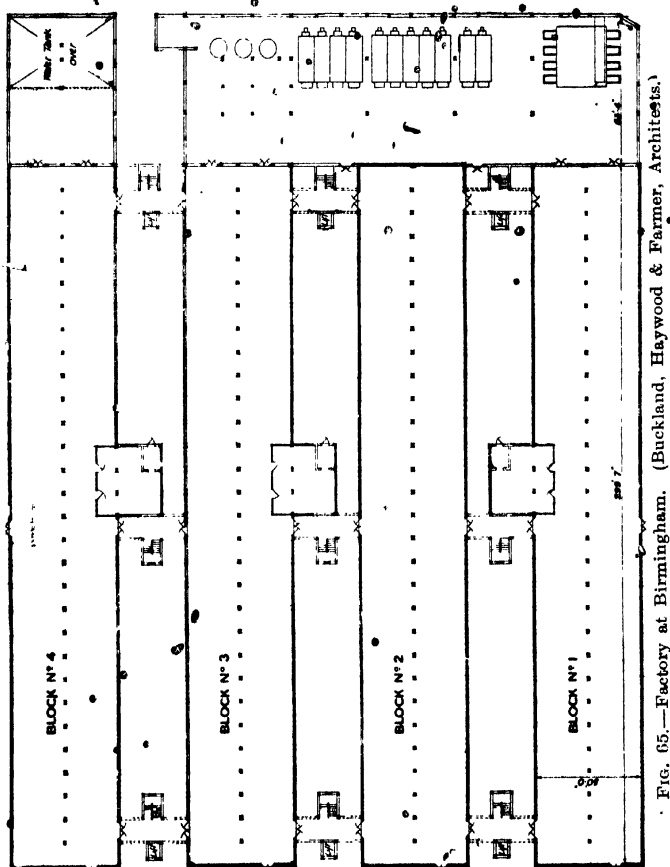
Factory at Birmingham. (Buckland, Haywood & Farmer, Architects.)
